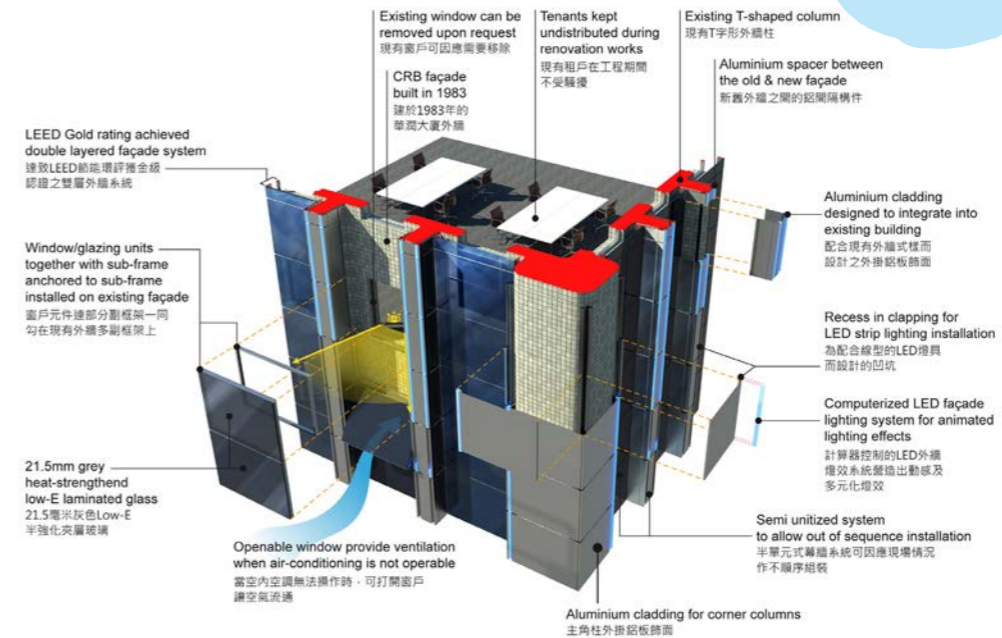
Illustration of the construction method of China Resources Building
